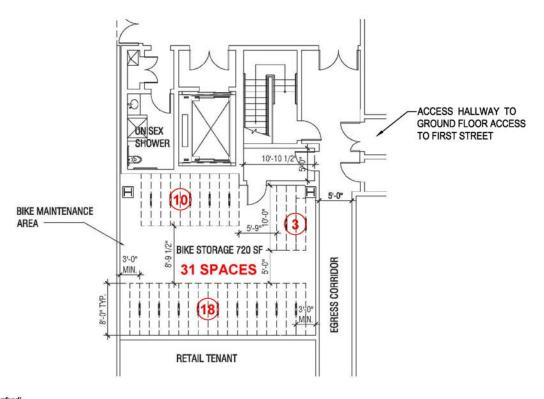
d.4 20 CambridgeSide Bicycle Parking Plan
